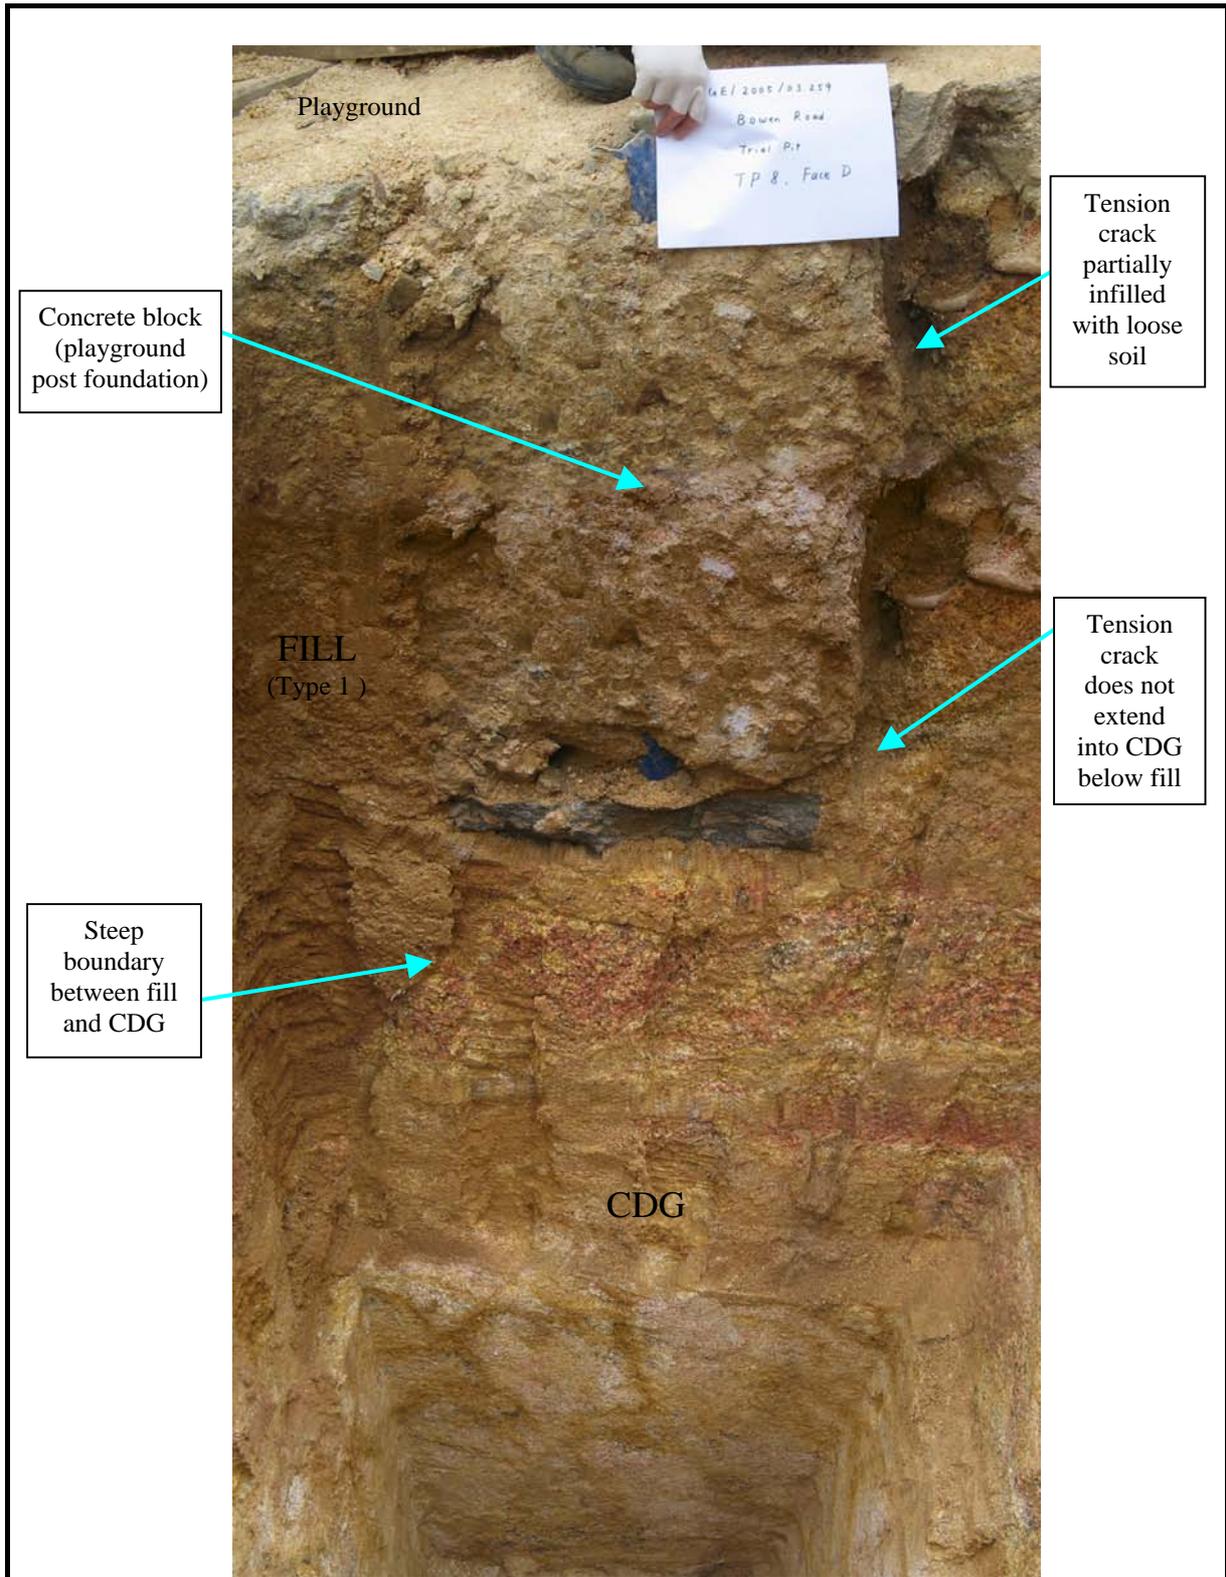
Tension Crack within Fill in Trial Pit No. TP8 (Photograph Taken on 11 April 2006)
